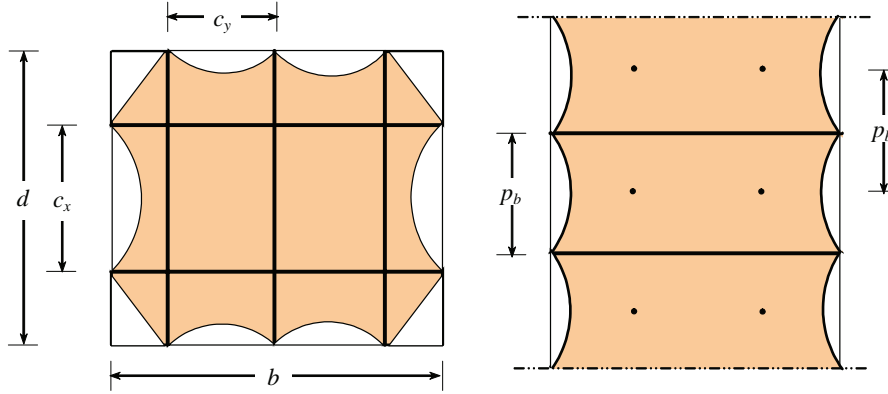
Plan and lateral view of confinement with FRP bars.
